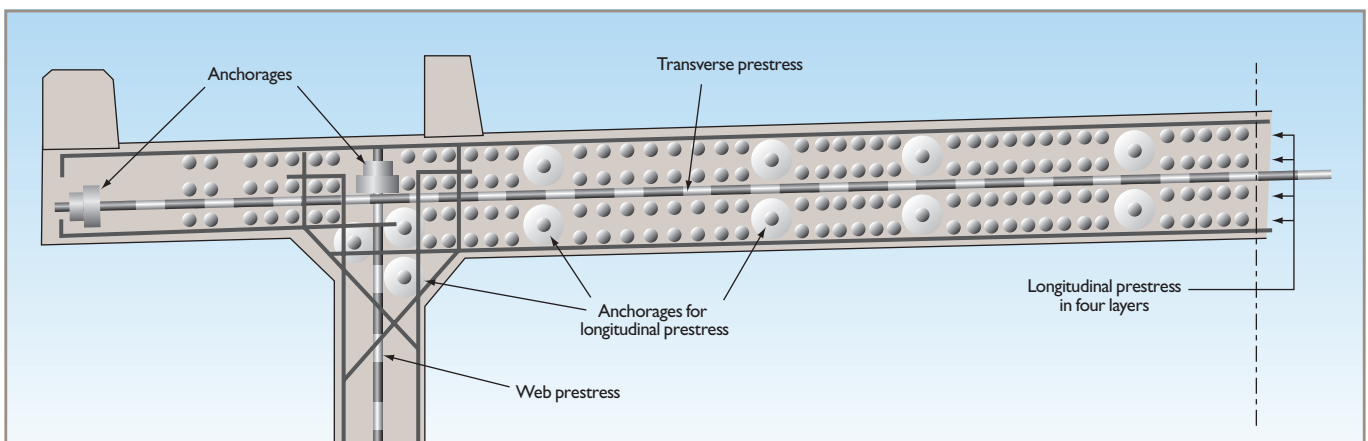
Cross-section of as-built top flange near where the bridge initially failed—un-reinforced concrete around some of the upper prestress anchorages may have been damaged during replacement of the road surface six weeks earlier
